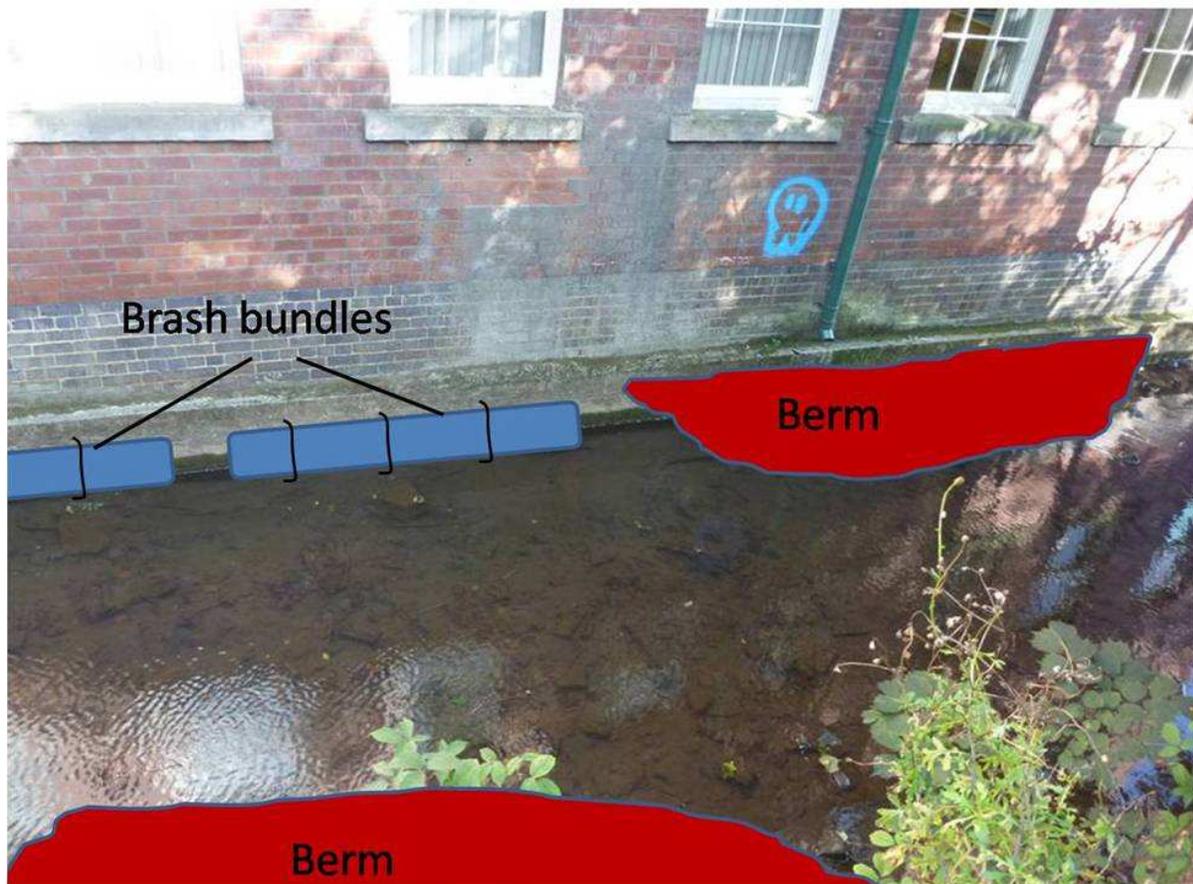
Example of locating "overhead" brash bundle cover. Bundles to be secured using wire to steel expansion bolts drilled into concrete wall. Berms to be constructed using a mixture of imported stone and redistributed stream bed material. Planting or seeding with appropriate native species should also be incorporated within the berms
